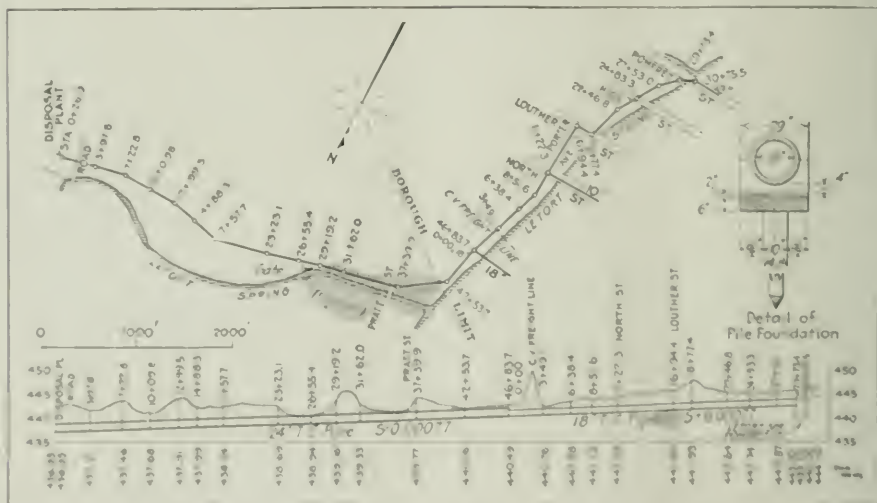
PLAN AND PROFILE OF OUTFALL SEWER, CARLISLE, PENN.
